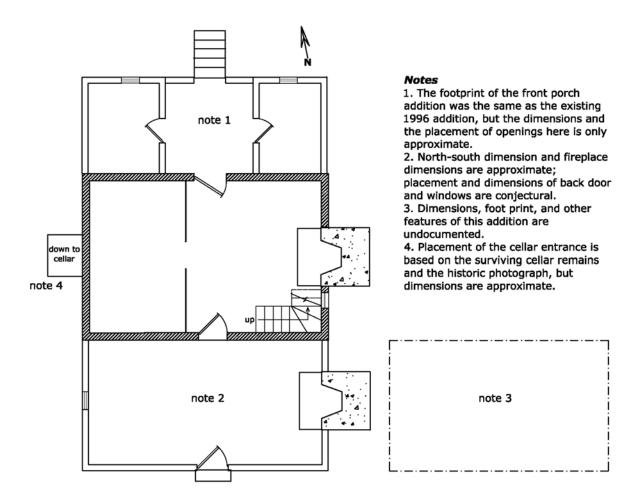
Reconstructed floor plan of Power-Hyde House as it existed at the end of the nineteenth century. (T. Jones, NPS, 2010)
